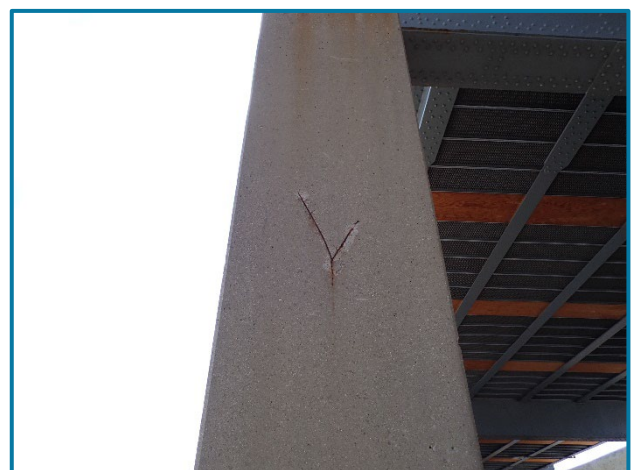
Typical shallow spall with exposed reinforcement wire ties due to lack of cover (looking south at the north face of Column 1 at Pier 5A).
